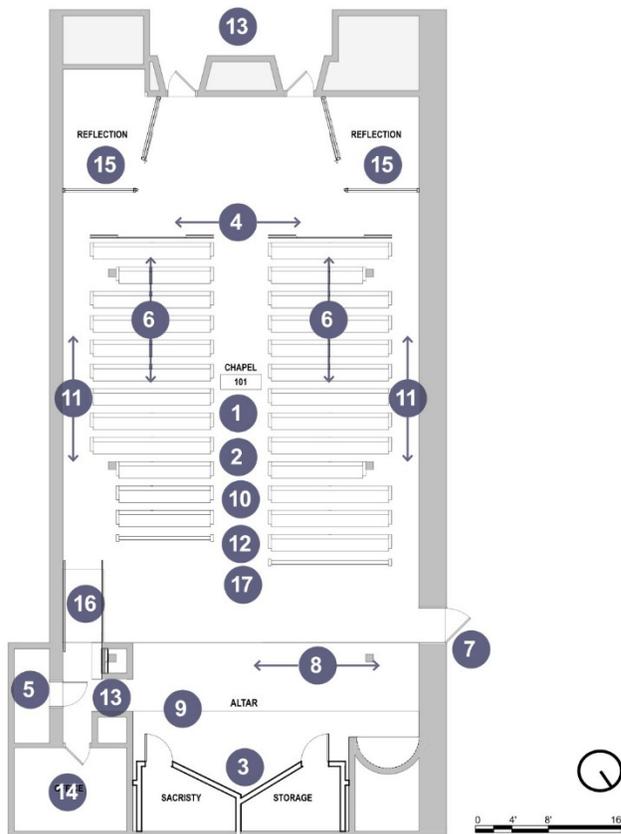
Chapel / Scope of Work / Roof Replacement
